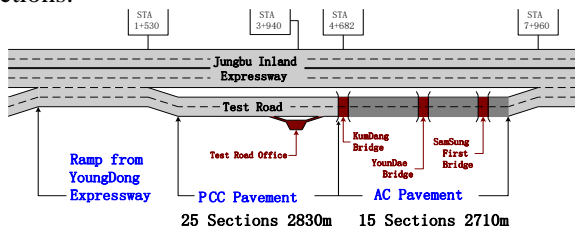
The pavement section configuration and measurement Location (Kim et al. 2003)
